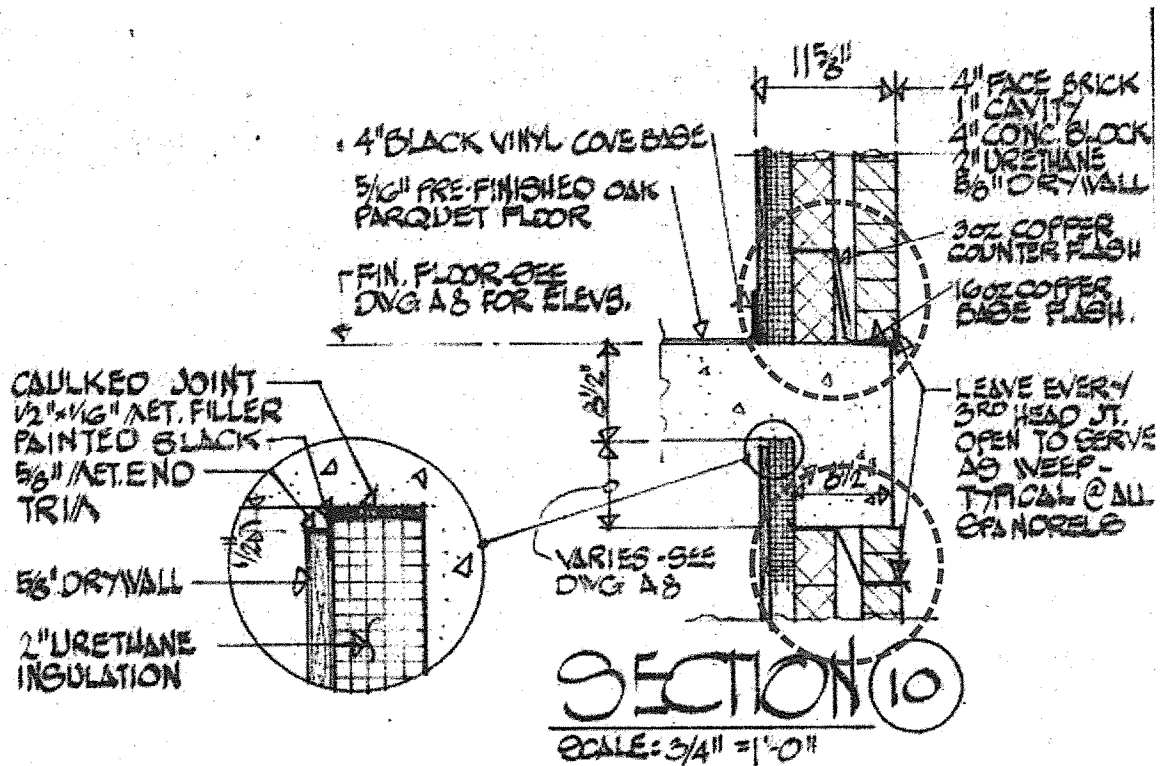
Typical section detail at floor line and concrete perimeter beam soffit from original construction documents, prepared by Robert Charles Associates, Inc., dated December 11, 1967. Note locations of through wall flashings (circled).
